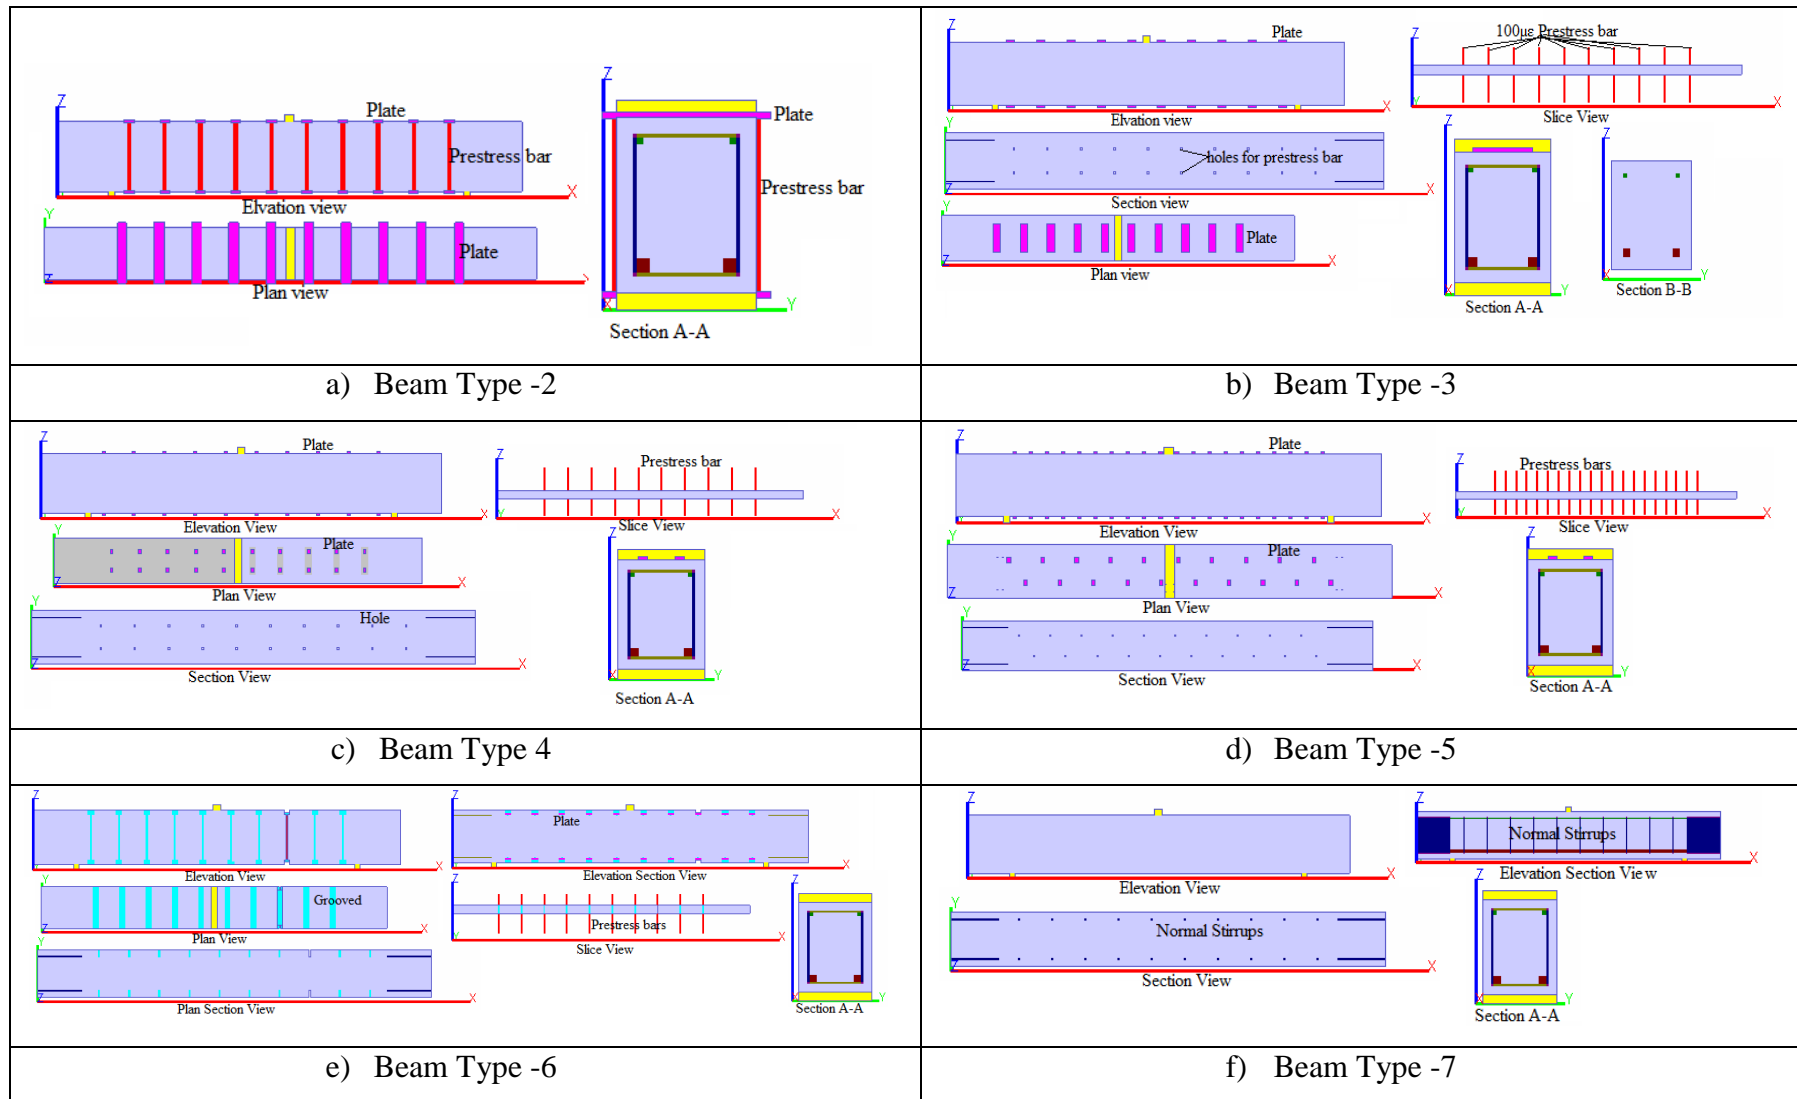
Beam Types and Additional Web Reinforcement Configurations
